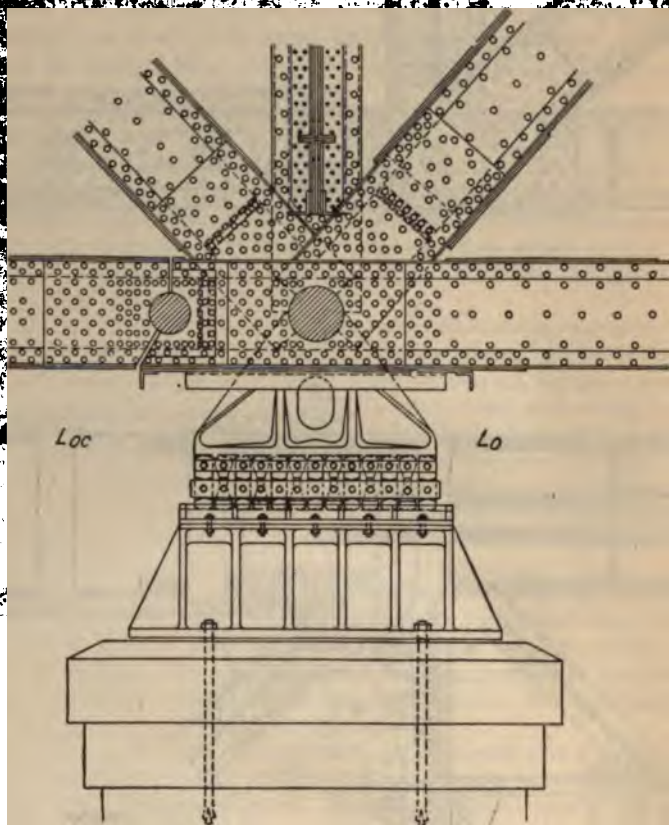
Details of the Bottom Chord Joint at the Piers of the Thebes Bridge.
